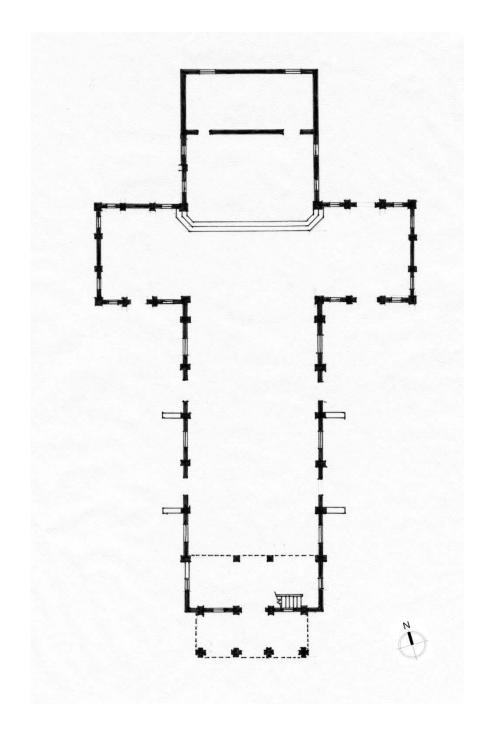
Ground floor plan of San Antonio de Padua Church in Sikatuna.
